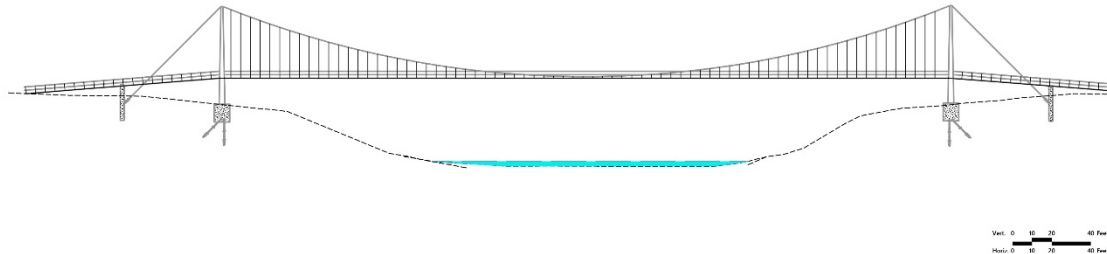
SITE SCHEMATIC OF PREFERRED ALTERNATIVE SHOWING 450-FOOT FLOOD ELEVATION (100-YEAR FLOOD IS 459 FEET)
